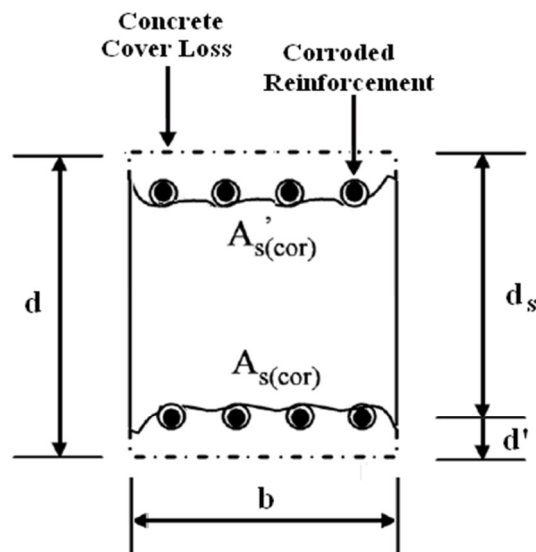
Deteriorated Cross Section with reductions in steel and concrete
